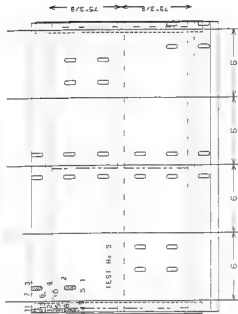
LVDI Locations (Second Bridge - Test No 5)
